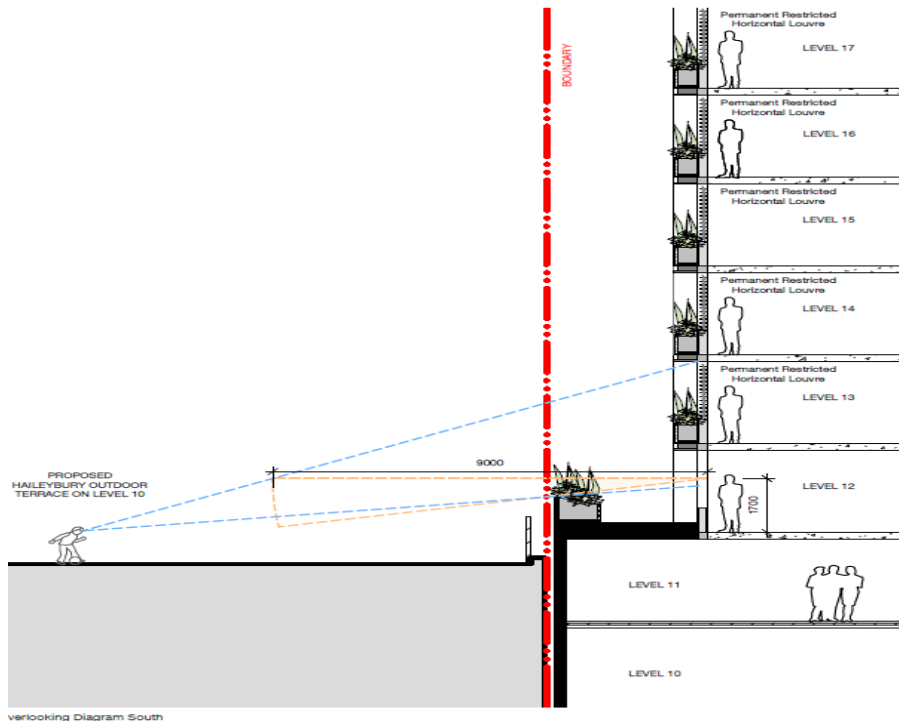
Proposed overlooking diagram demonstrating how proposed screening prevents overlooking into the rooftop terrace of 383 King Street.
